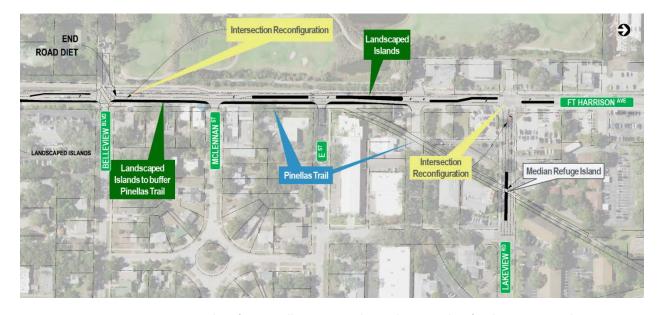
Concept Plan from Belleview Boulevard to north of Lakeview Road
